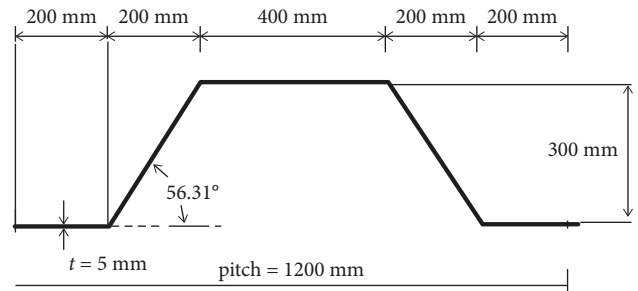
A typical cross section (one pitch) of a blast wall [1].
